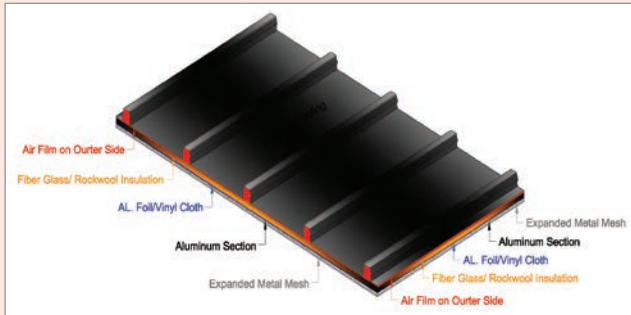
Underdeck insulation with fiber glass / rockwool insulation for metallic roofing
